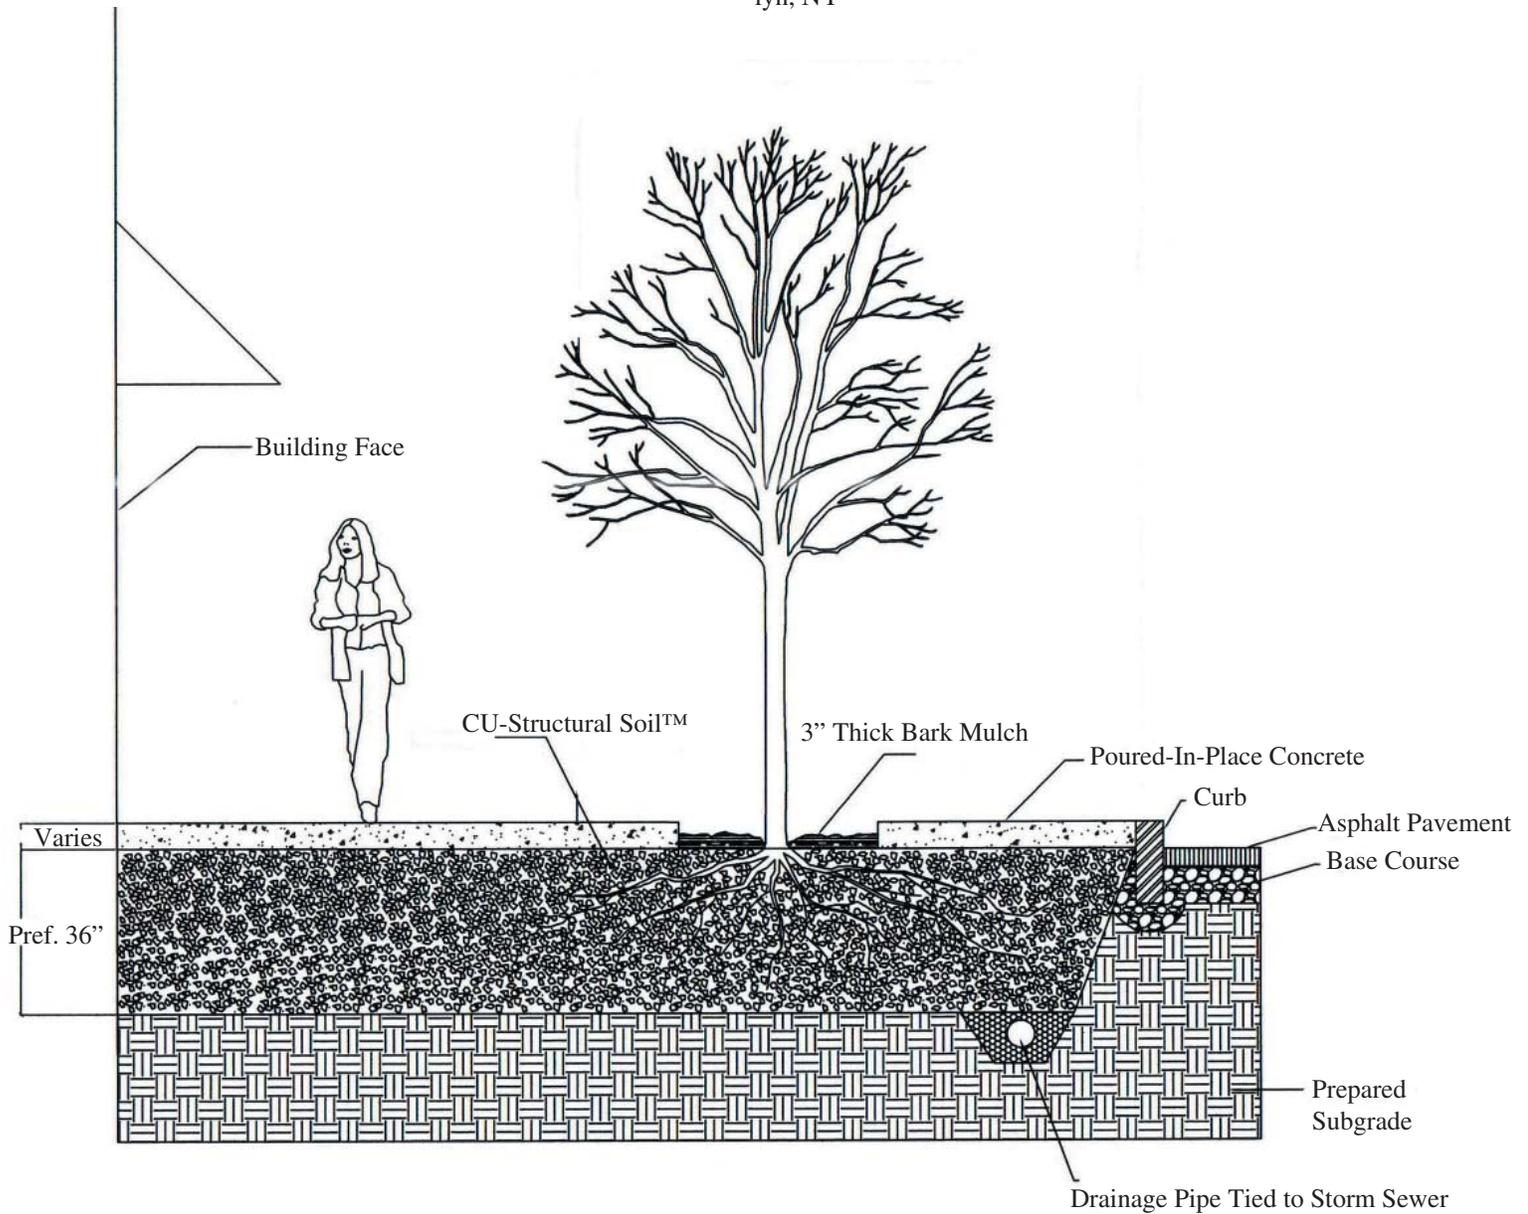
Typical street tree planting using CU-Structural Soil™ under a sidewalk
